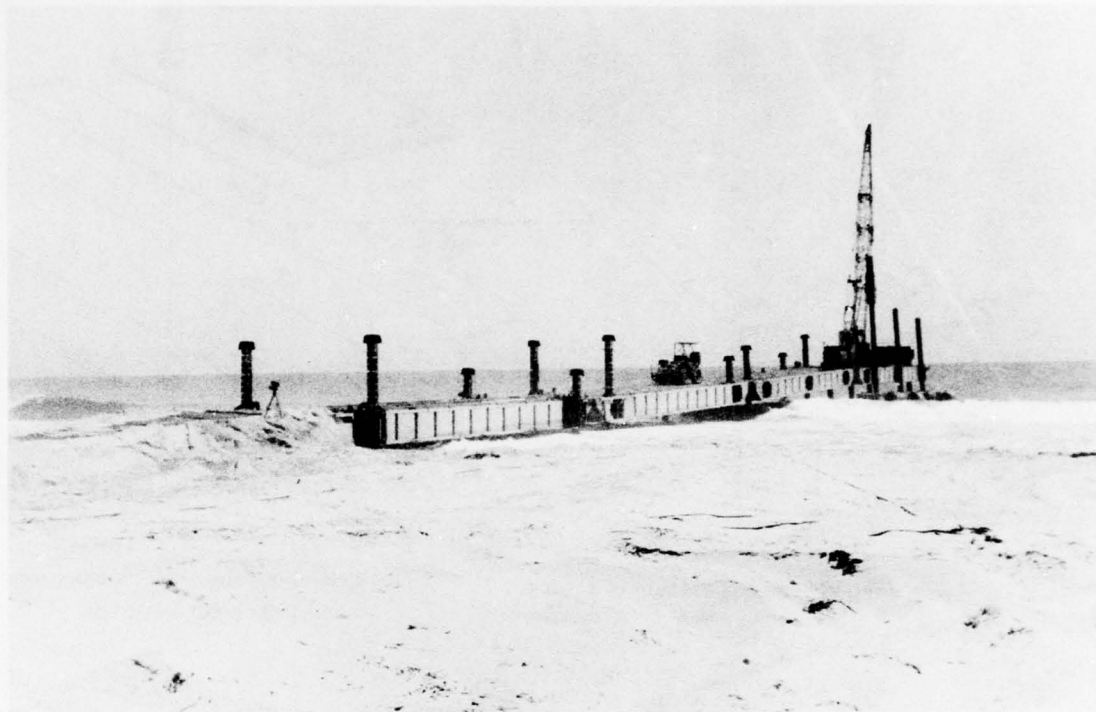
Elevated causeway structure erected for Phase I tests at Point Mugu, California.
